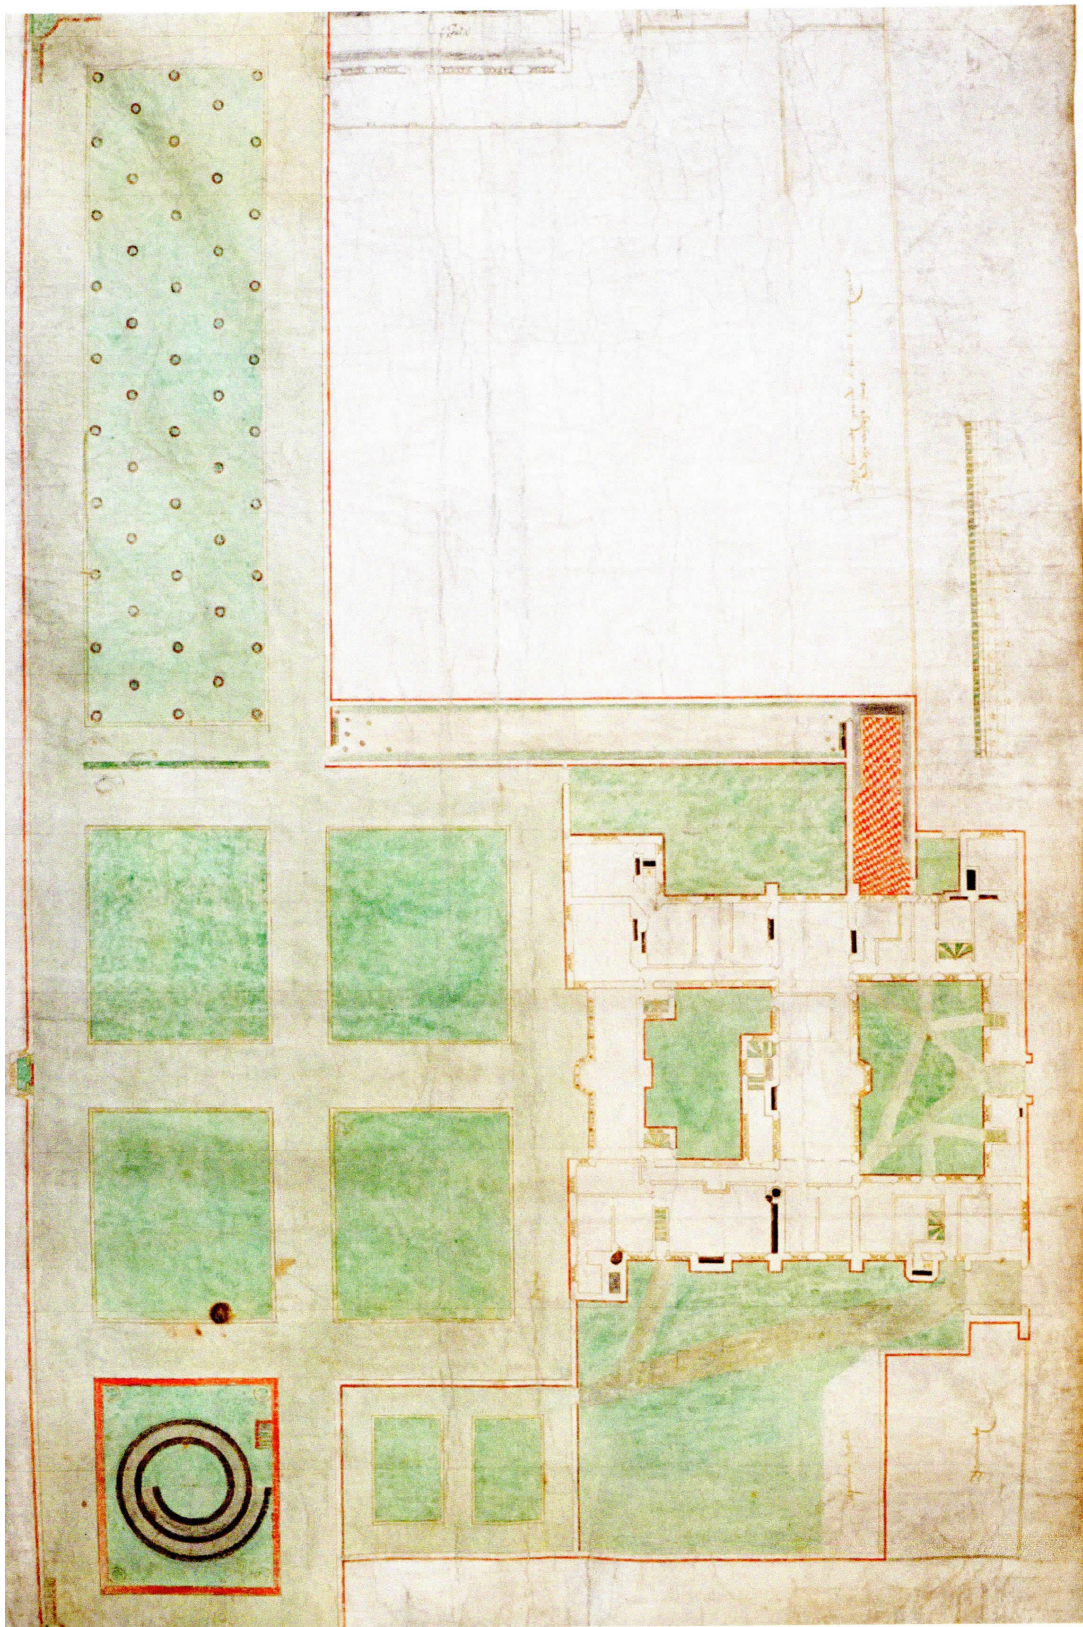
Cecil House, The Strand, showing tiled flooring of the leisure facility, 1562-67.
